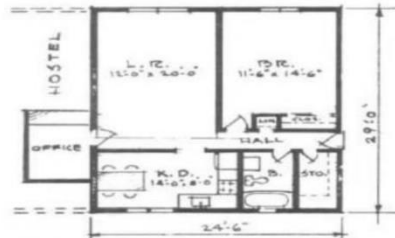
Typical apartment layout. Note: This is an average-size apartment. More space and room is always desirable. This is one of many possible layouts.
